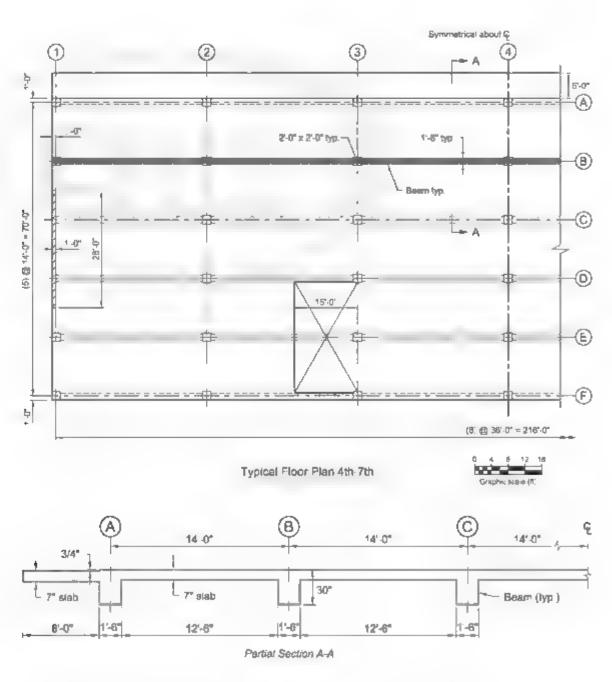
Framing plan and partial section showing six-span interior beam.
